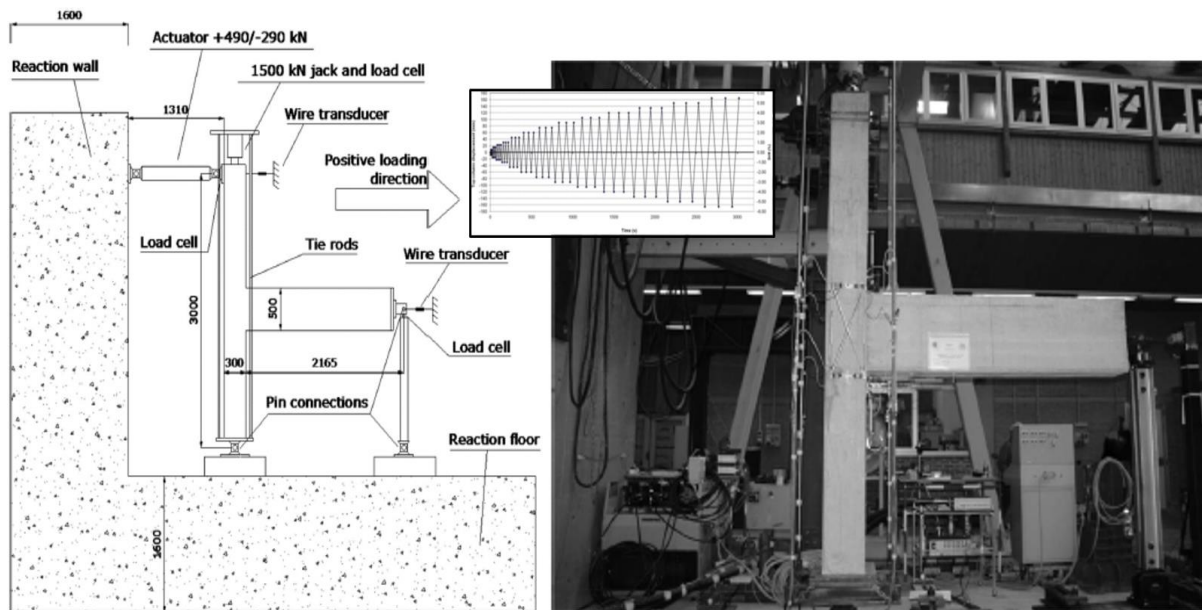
Cycle load test scheme on RC beam - columns joints specimens [17]
